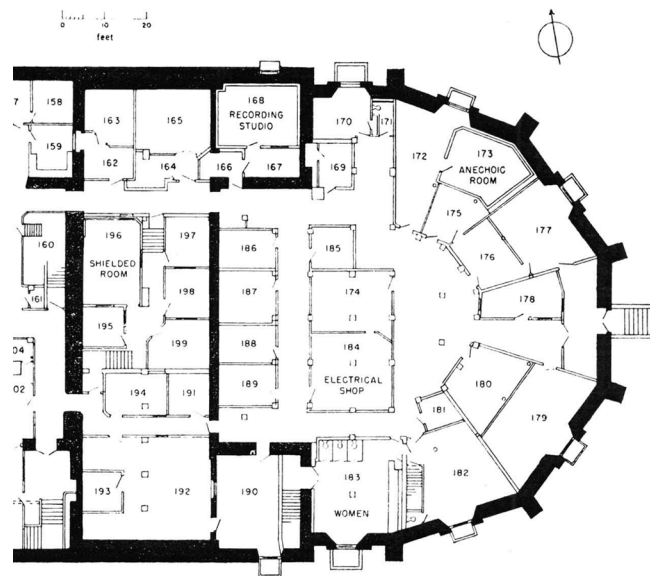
Plan of the Harvard Psychology Laboratory with anechoic room (1947).
